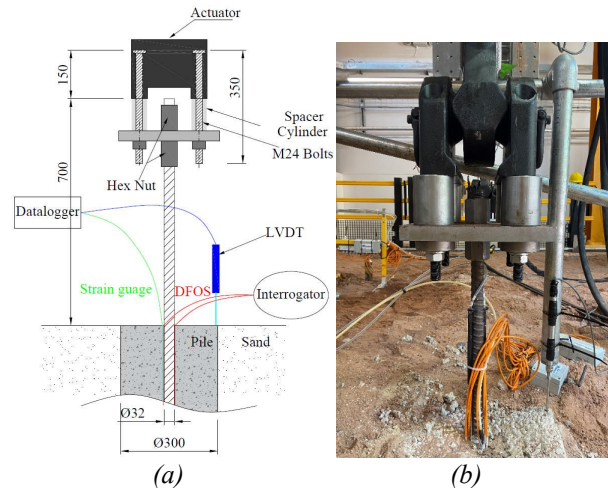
Instrumentation and loading structure, (a) configuration and dimensions (b) bolted plate connecting structure between actuator and pile rebar
